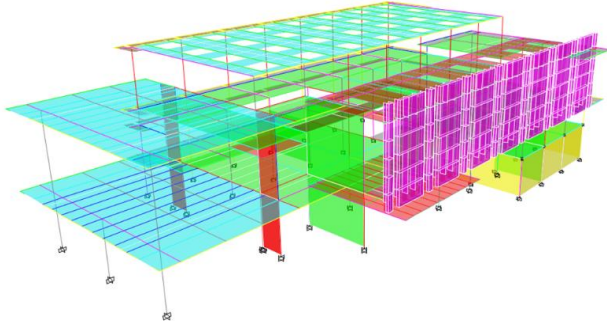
FEM model of the structure with 5 new reinforced concrete walls
